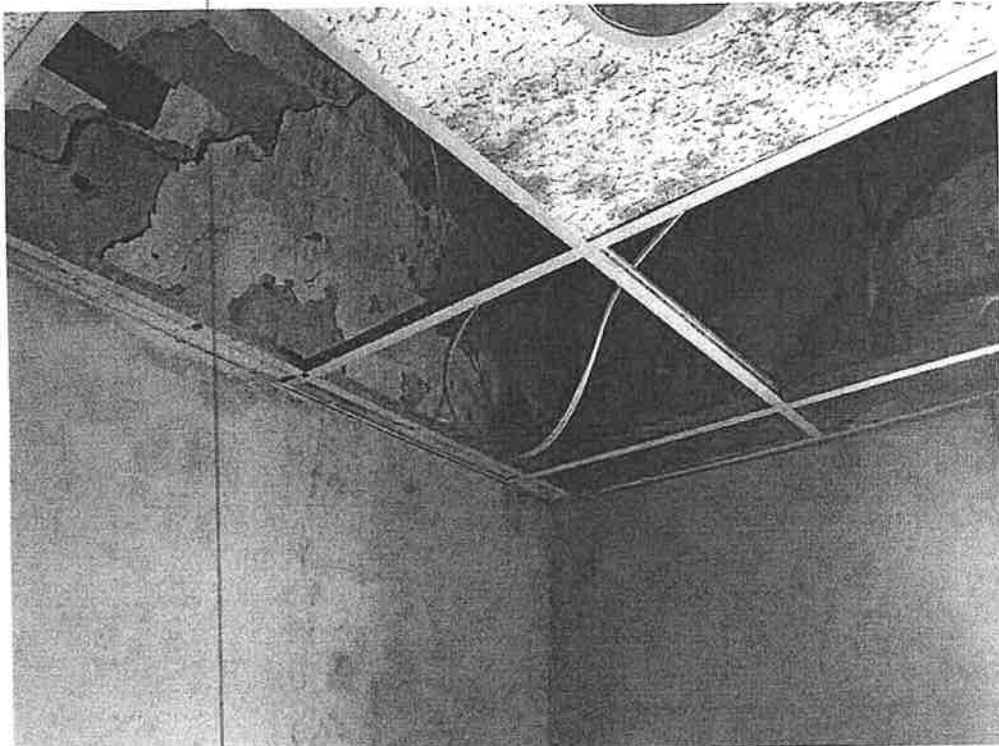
Moisture damage at lobby walls and ceiling. Note apparent mold growth.
